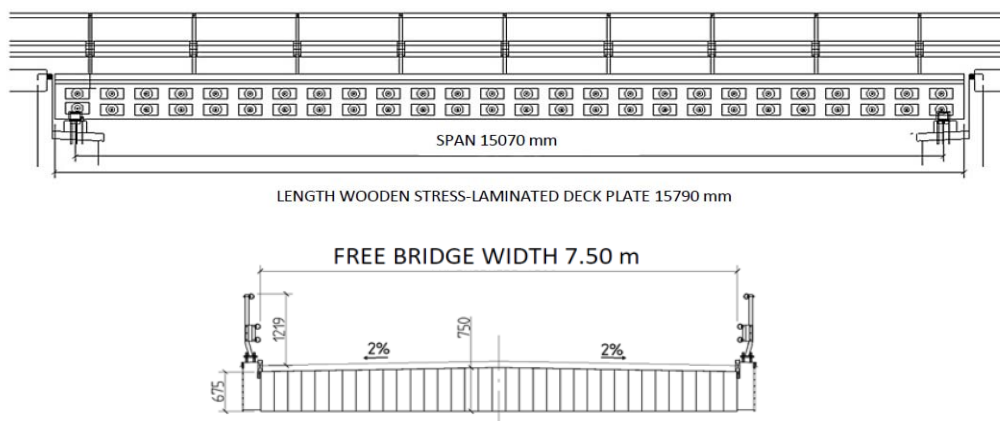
Details of the wooden bridge; elevation (above) and section (below)
